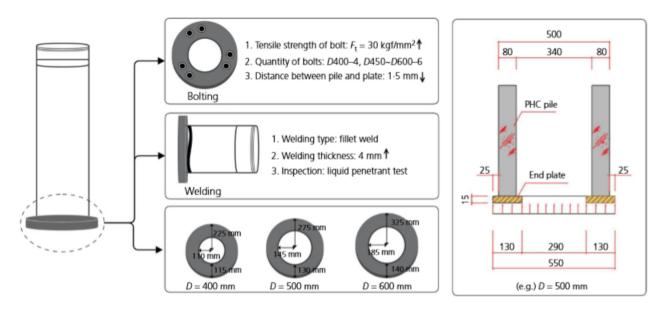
Connection methods and details of the Ext pile (dimensions: mm)
